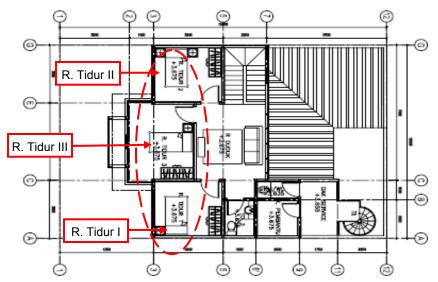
Floor Plan of the Upper Floor (Jaya Real Property, PT.Tbk. 2008a)
